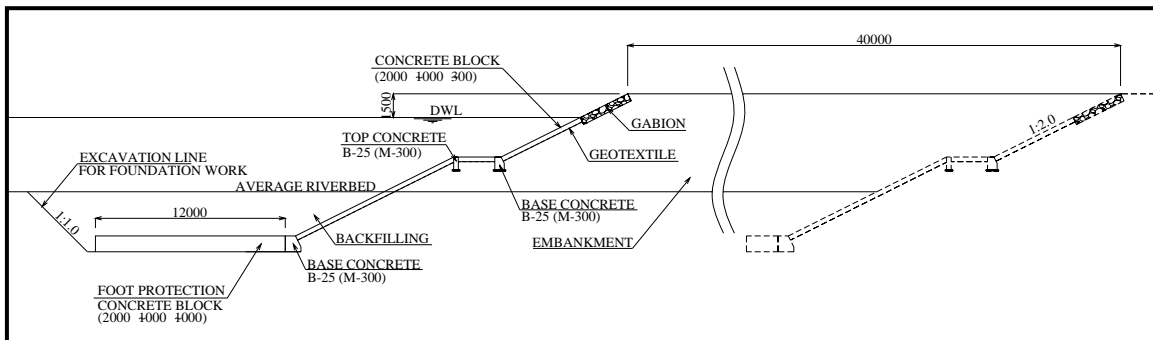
Typical cross-section and construction procedure of Spur Dike
